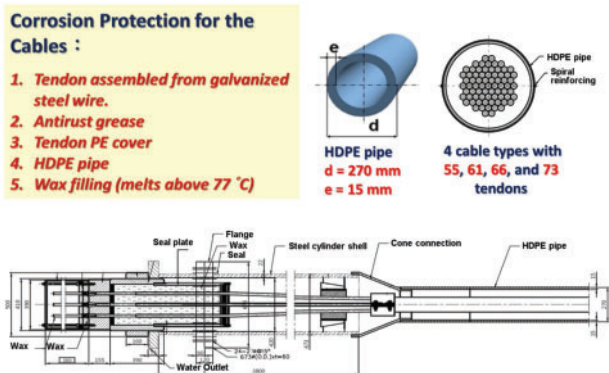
Detailed assembly and corrosion protection system for the steel cables
